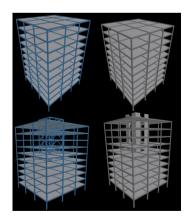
Wind loads in kips and perspective of 10-story building, (130') height with different structural systems.
